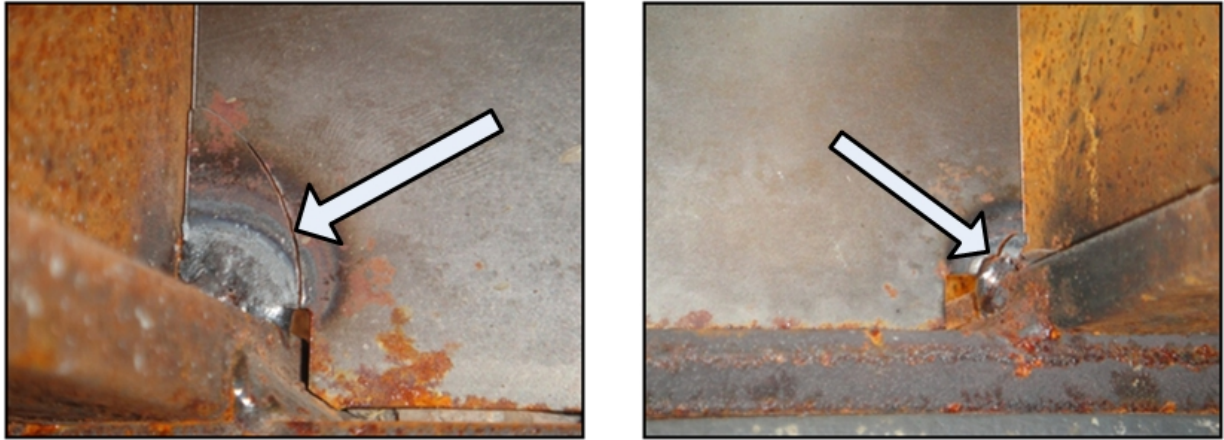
Fatigue cracking in form pans (Left) Typical crack observed; (Right) Other crack observed
